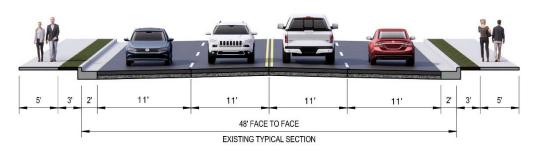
County A to Pilgrim Drive (Center) Existing Typical Section, facing north
